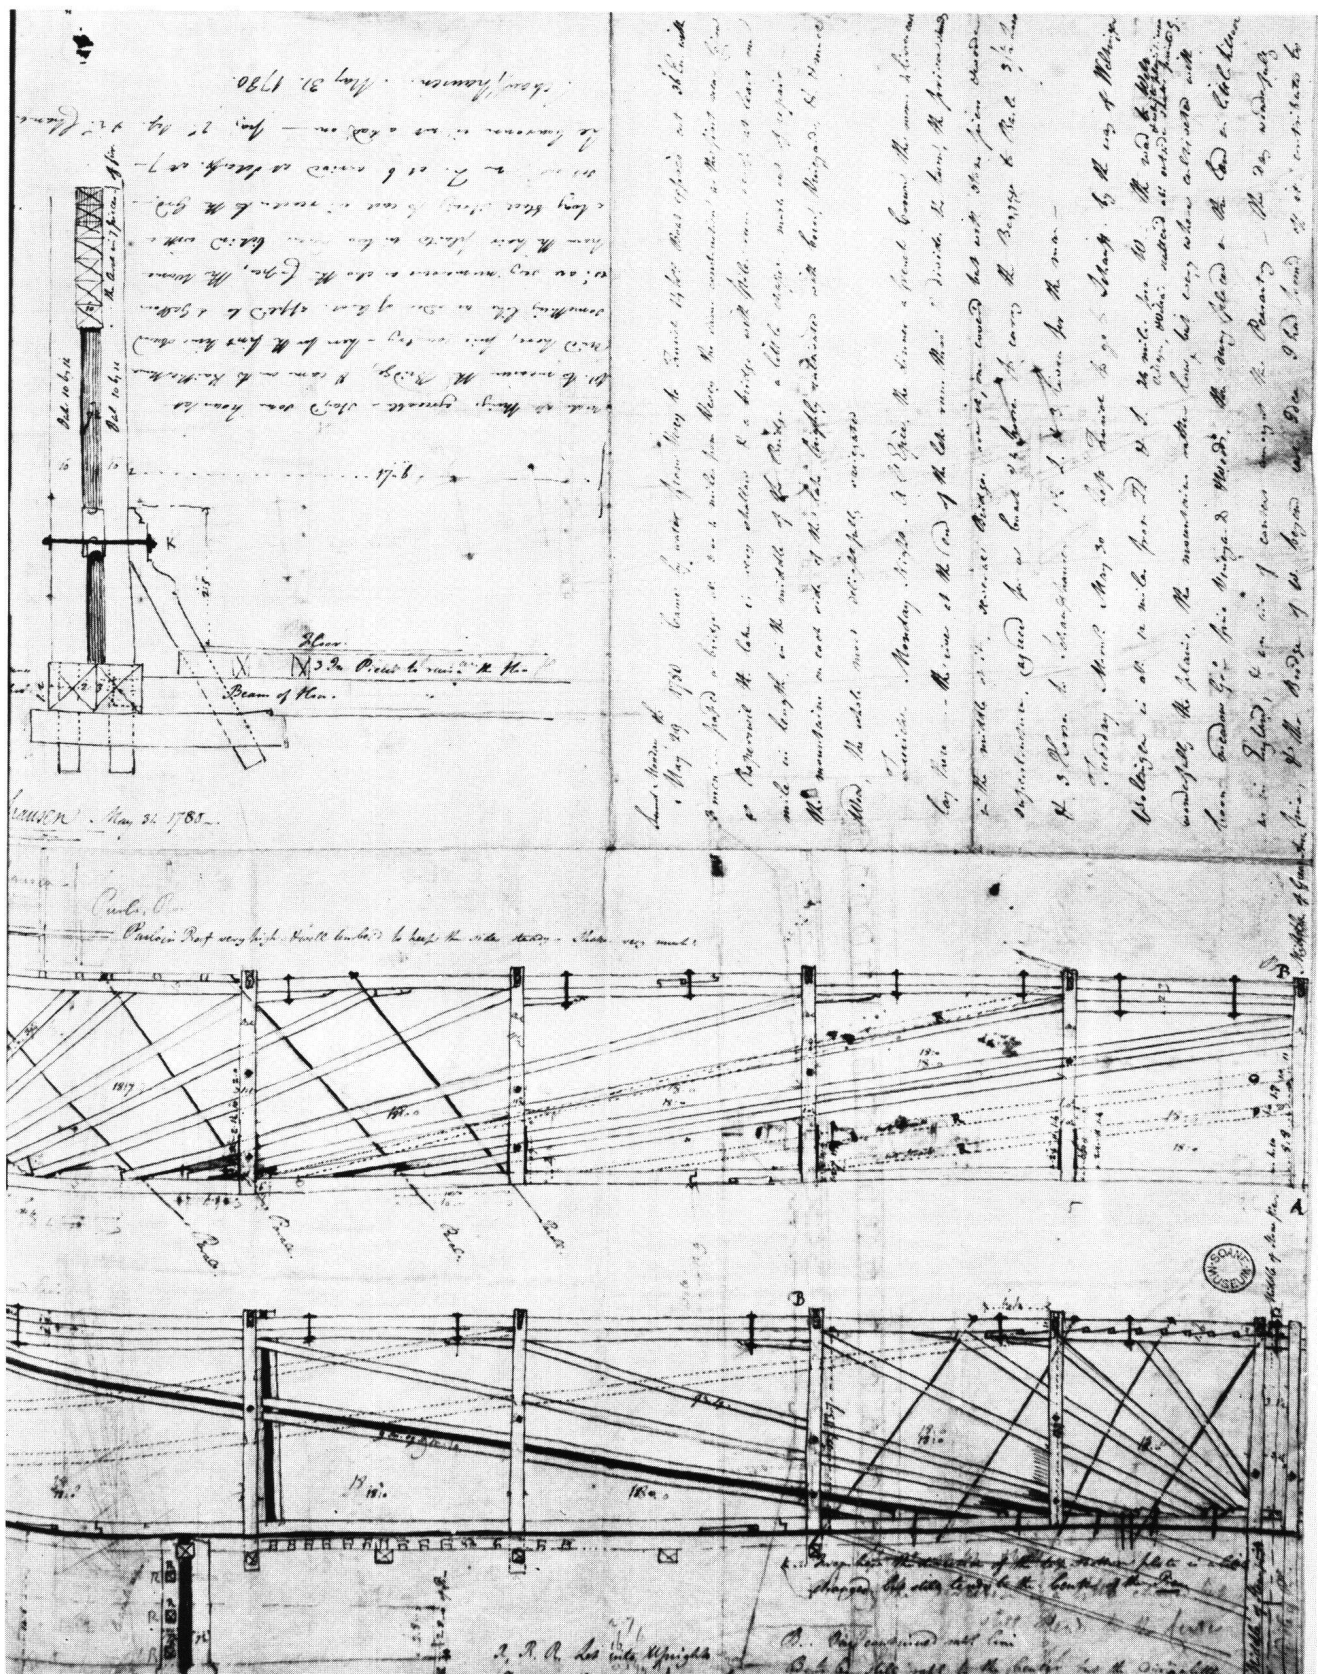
John Soane: bridge at Schaffhausen; drawing showing section and a detail
